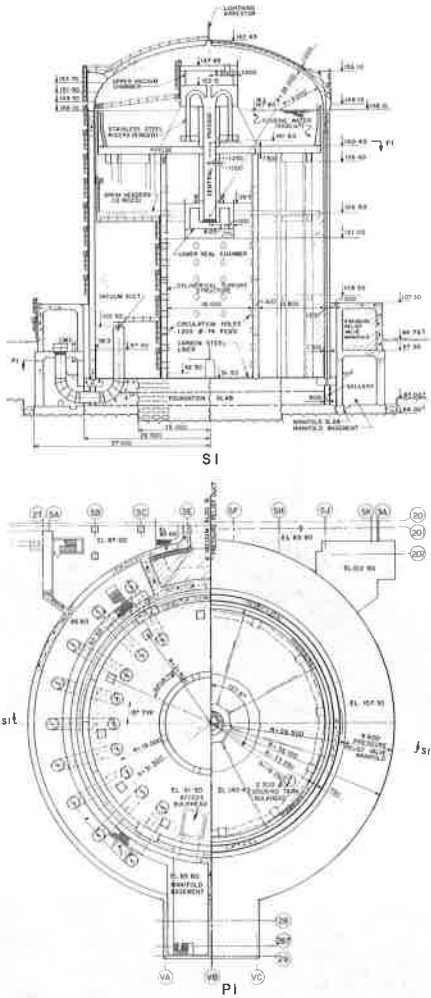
Derlington GS Vacuum Building - domed roof, ring girder and perimeter wall are monolithic prestressed concrete independent of internal structure. The floor and the bottom 6.5 metres of wall are lined.
